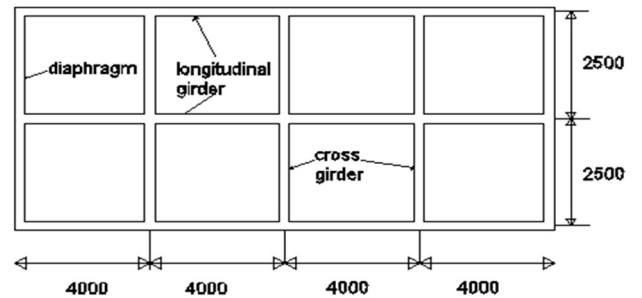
Cross section of bridge deck, (Raju, 2017)
